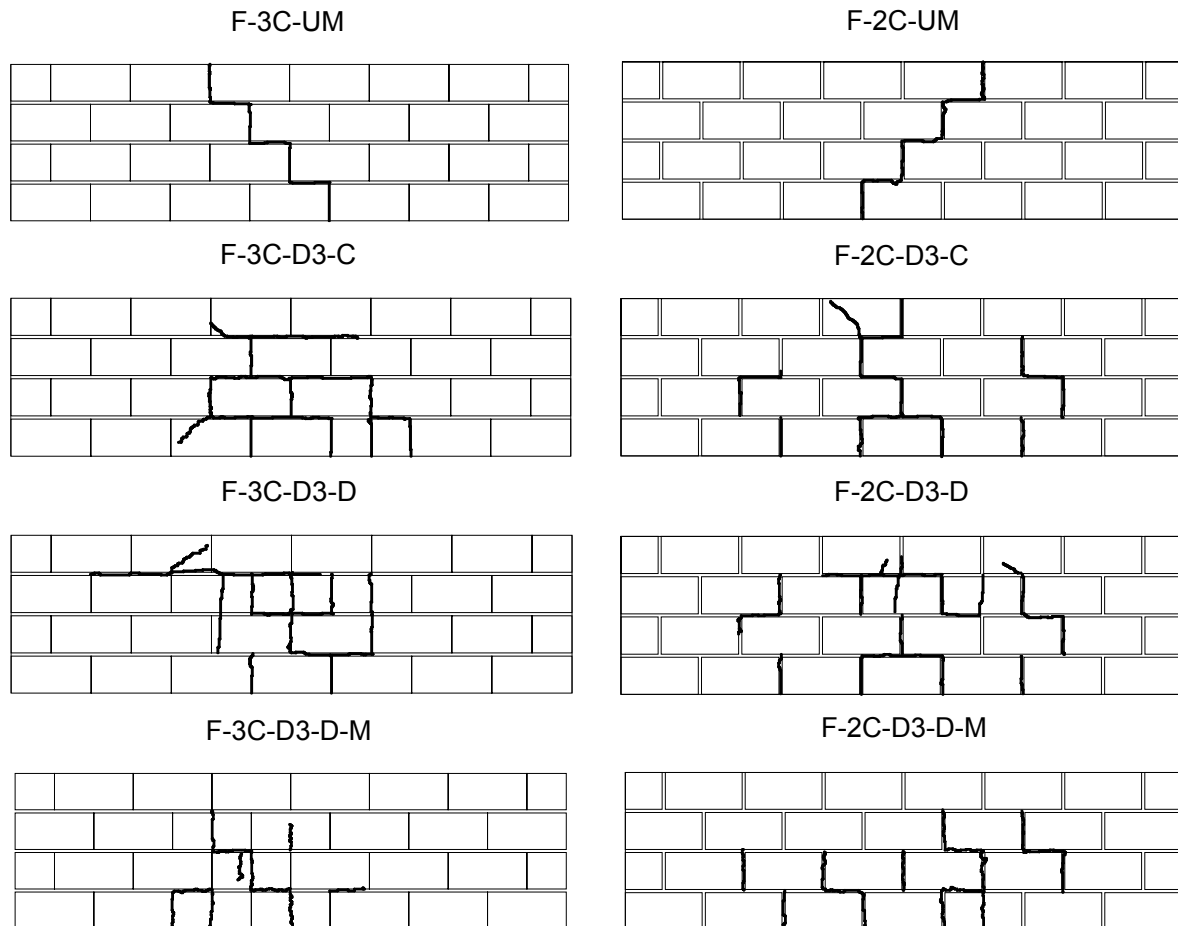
Cracking patterns in four point load tests of masonry beams which presented a flexure failure.
